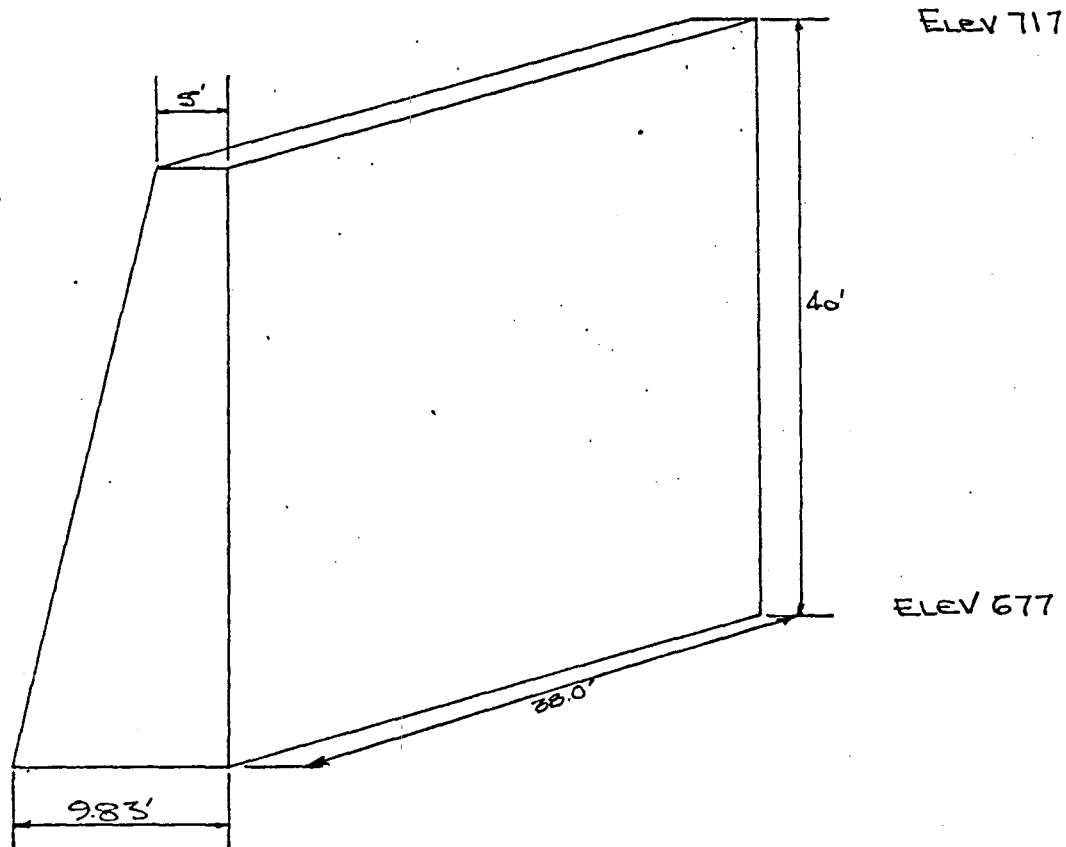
RIVER WALL - LOWER GUARD WALL R-32
